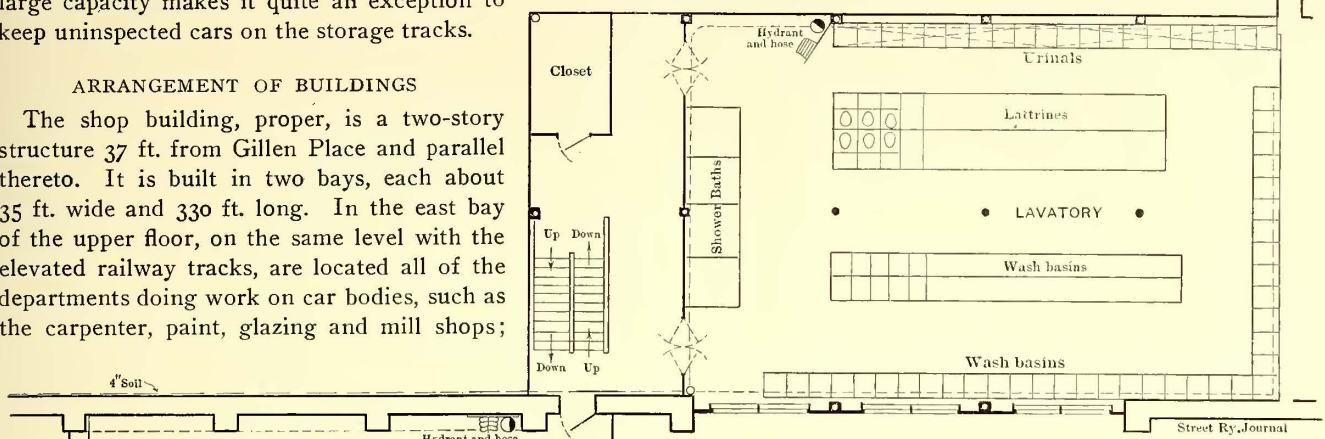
PLAN OF THE MEZZANINE FLOOR OF THE SHOP, USED AS A LAVATORY AND TOILET ROOM, AND OF THE LOCKER ROOM, ON THE SAME LEVEL, CONSTITUTING THE LOWER FLOOR OF THE OFFICE BUILDING
